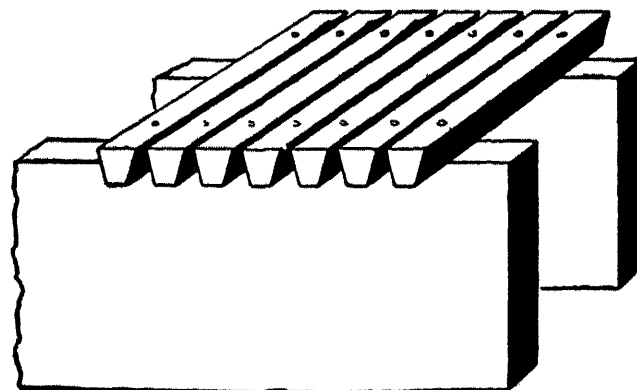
Section of a Kiln Floor. Showing the Method of Construction.
